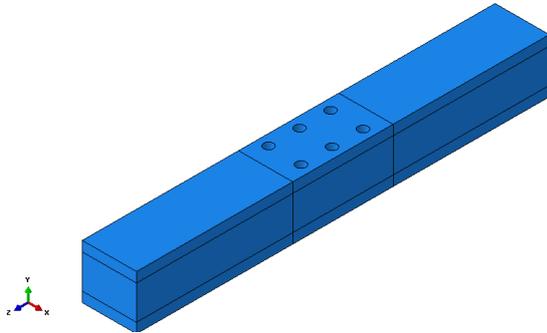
Bolt to concrete column connection zones embedded in the steel box
